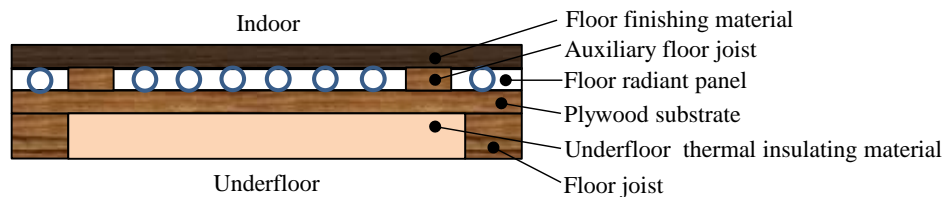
Example of Floor Radiant Panel Installed in New Detached Houses
